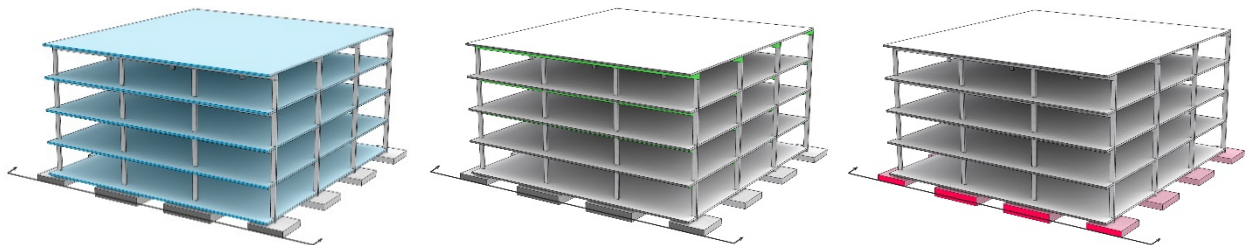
Structural systems that typically work in bending (a) Flat one-way spanning floor slabs (b) Beams (c) Spread footings
